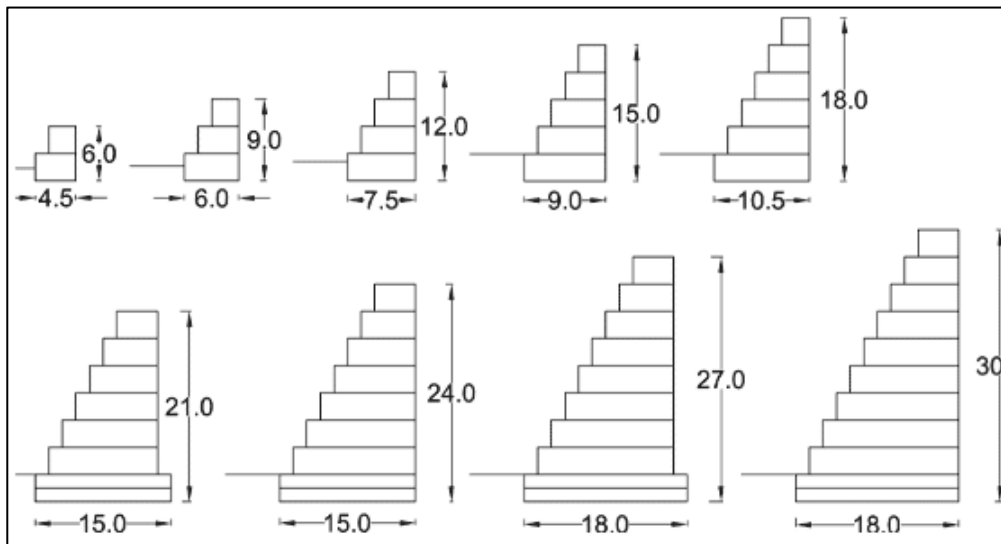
Sample design dimensions and arrangement for Gabion walls
